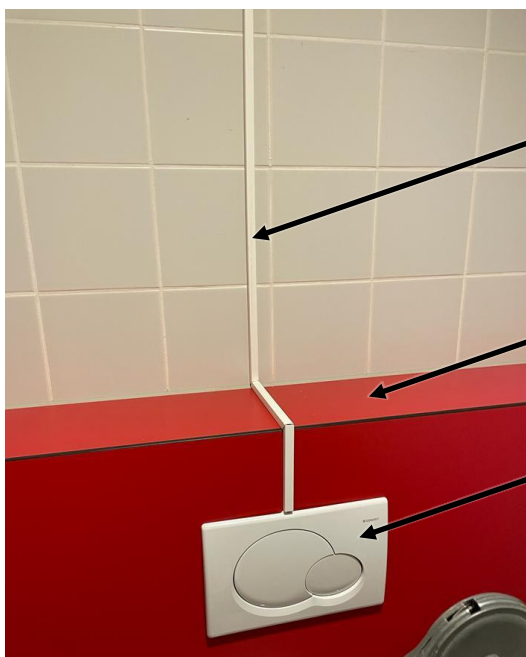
Flushing button panel and cable gutter as a toilet visitor would see it during the Phase 1 data collection.
